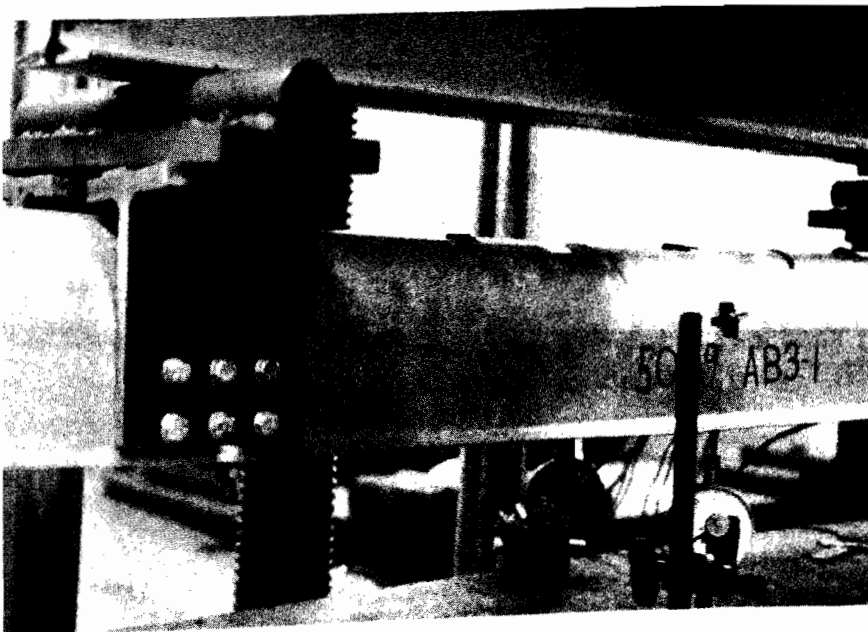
Typical Wrinkling Failure in an AB Beam Specimen
